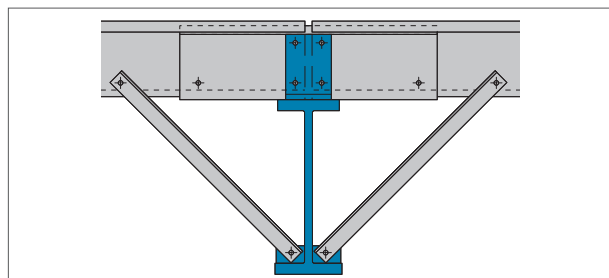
Example of rafter stays fixed to the purlins through additional holes
